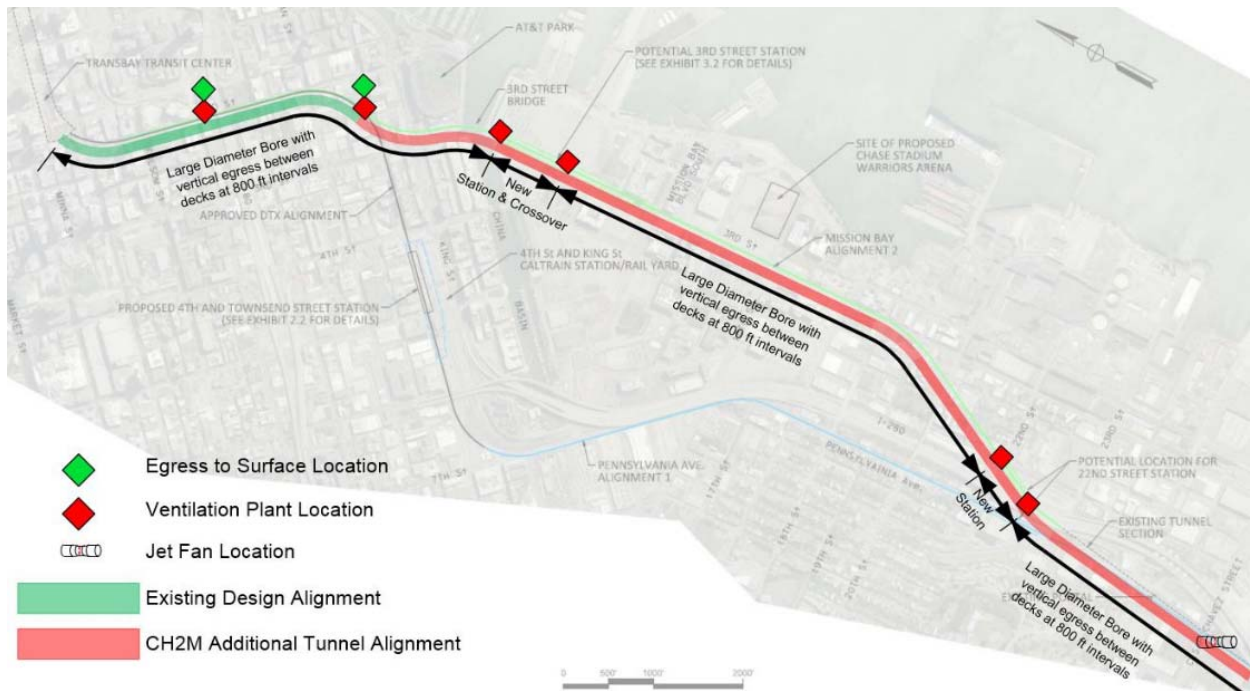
Mission Bay Alignment, Alternative 3 Ventilation Plan
